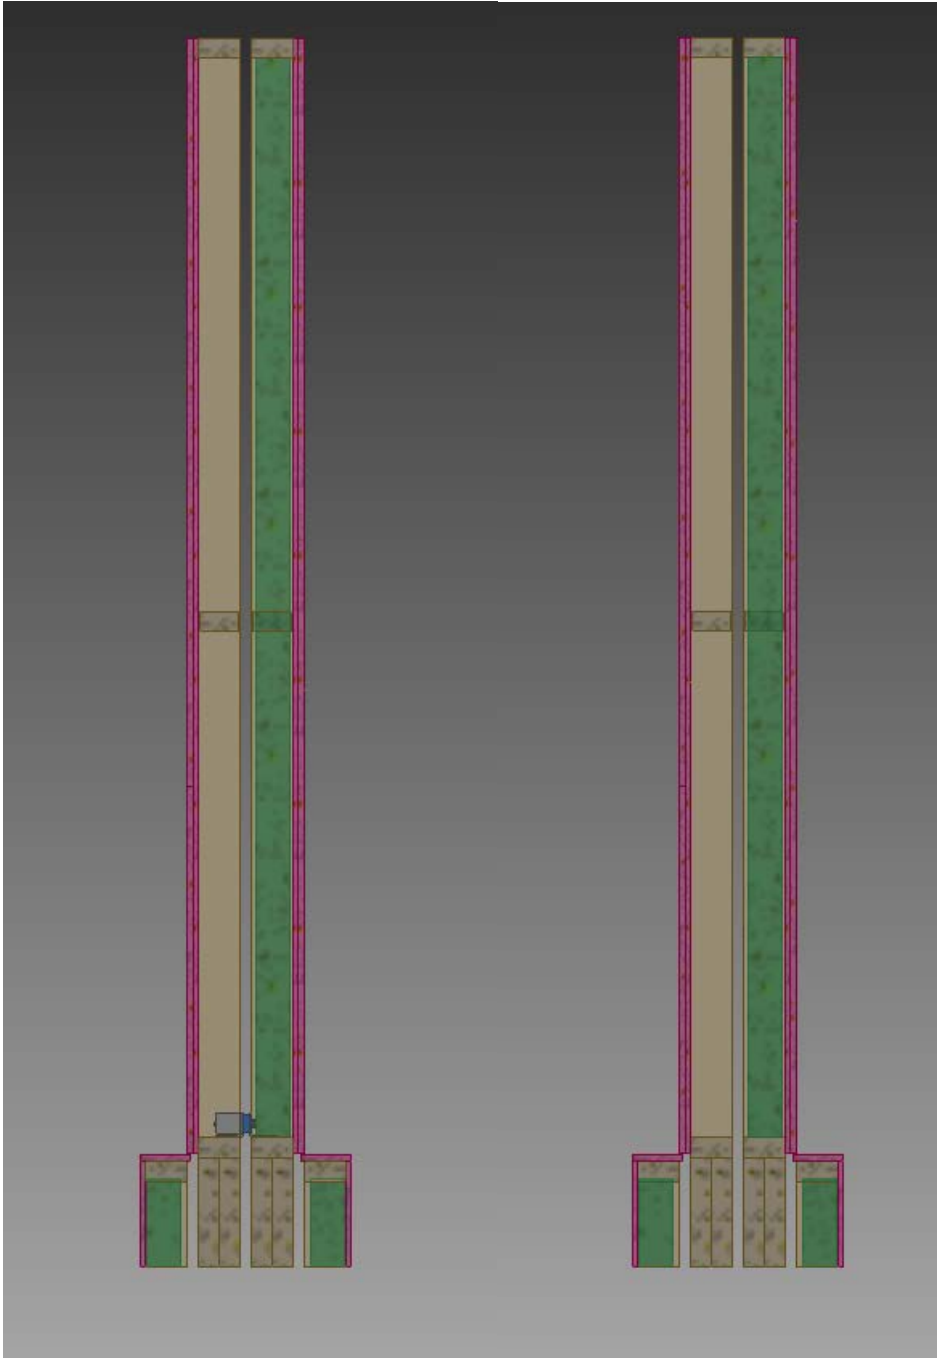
Cross section of the double stud acoustic test wall with and without the connectors.
